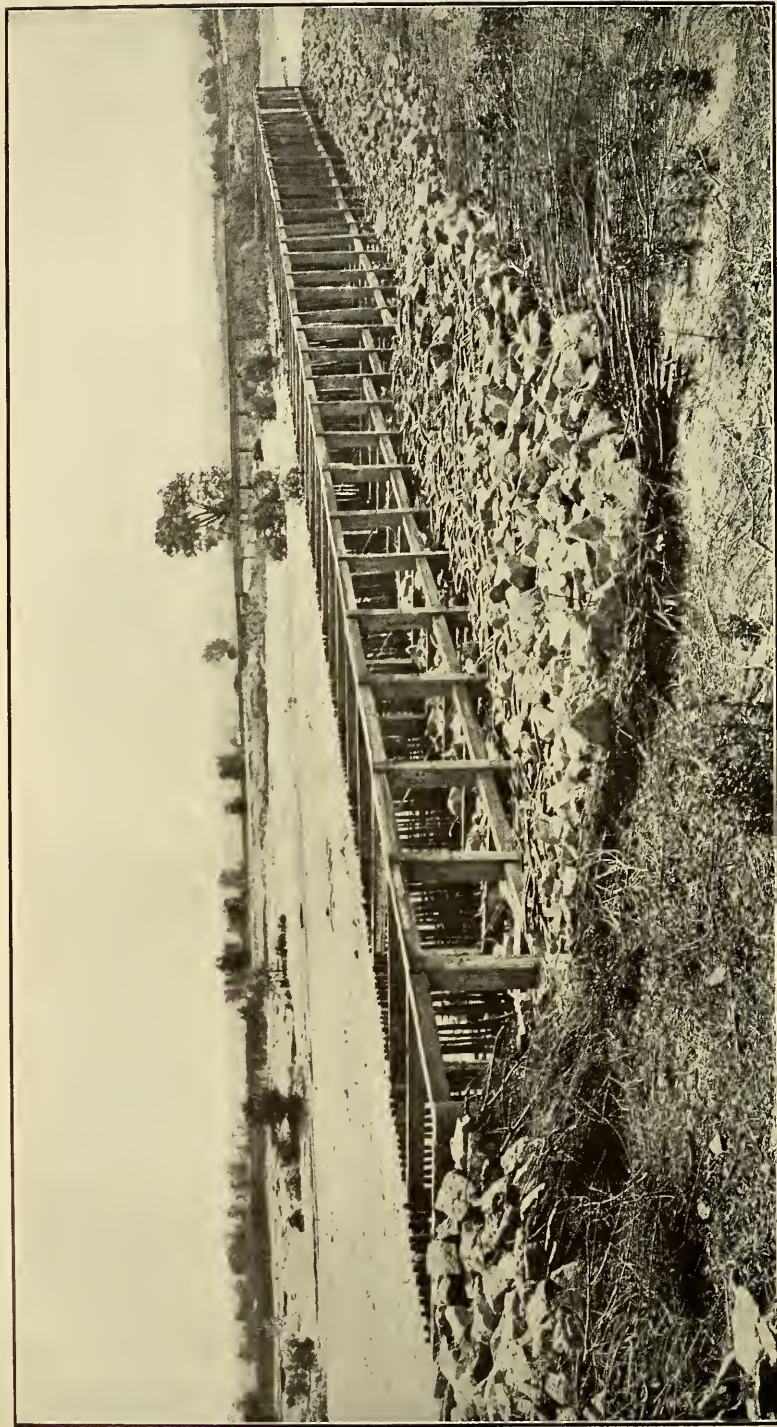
NEW TYPE OF HURDLE RECENTLY ADOPTED ON THE MISSOURI RIVER; TWO-ROW CONCRETE DIKE CONSTRUCTED WITH CONCRETE PILES AND CONCRETE BRACES.
